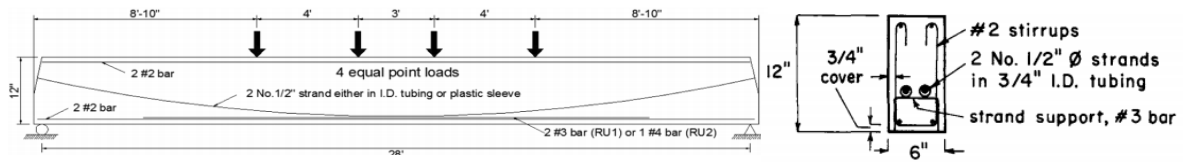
Experimental setup and details for beam (RB1) details (Mattock *et al.* 1971).
